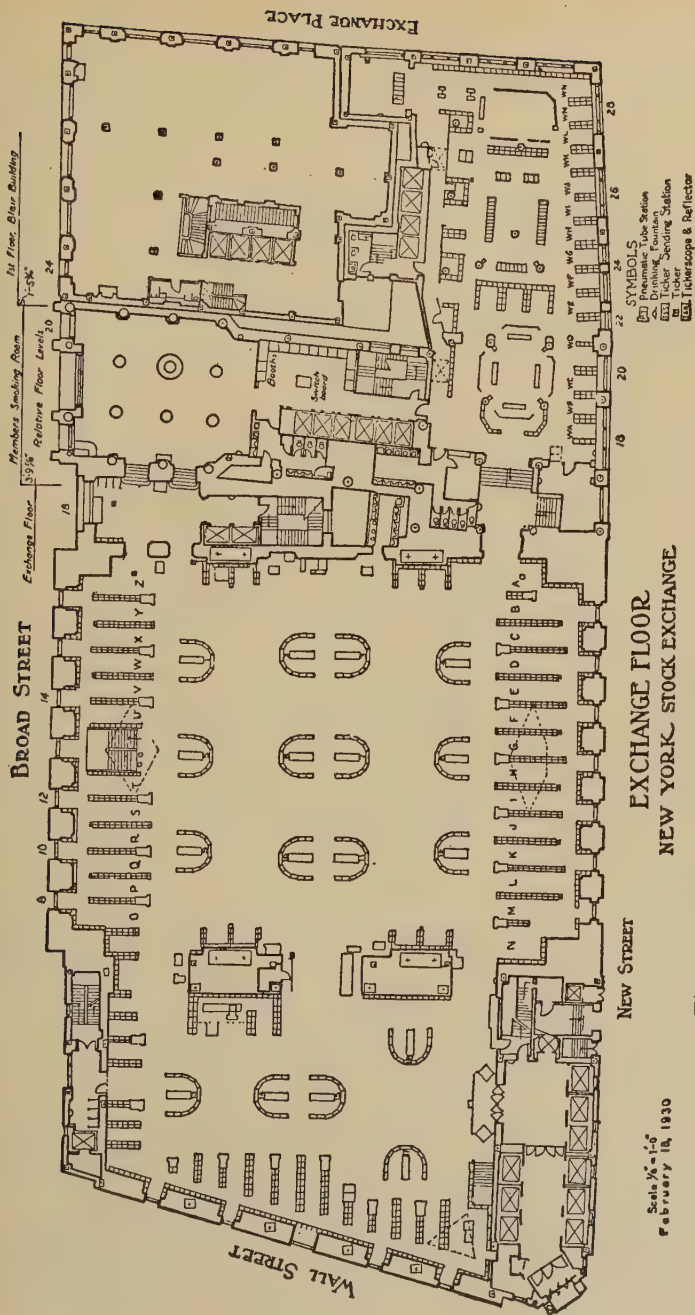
Plan of Ground Floor of the New York Stock Exchange
